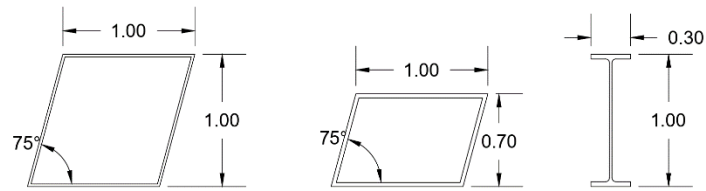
Cross-Section of the Main Beams / the Arches / the Transversal Beams [Own elaboration]
